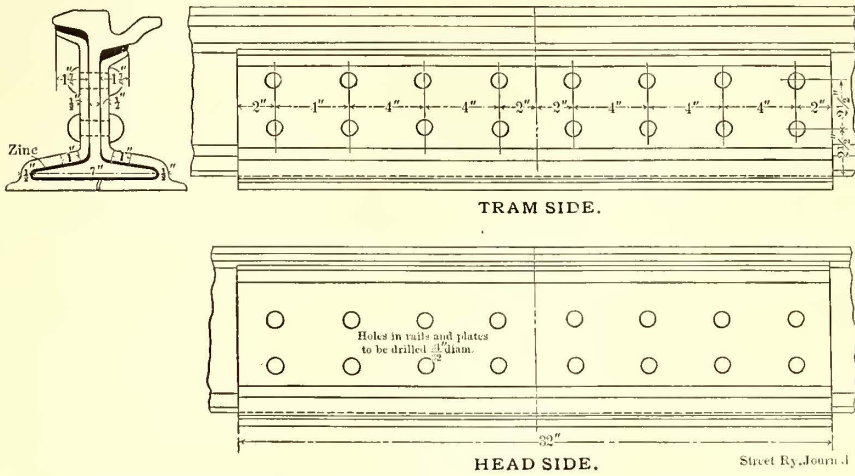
CROSS SECTION AND SIDE ELEVATIONS OF ZINC JOINT
